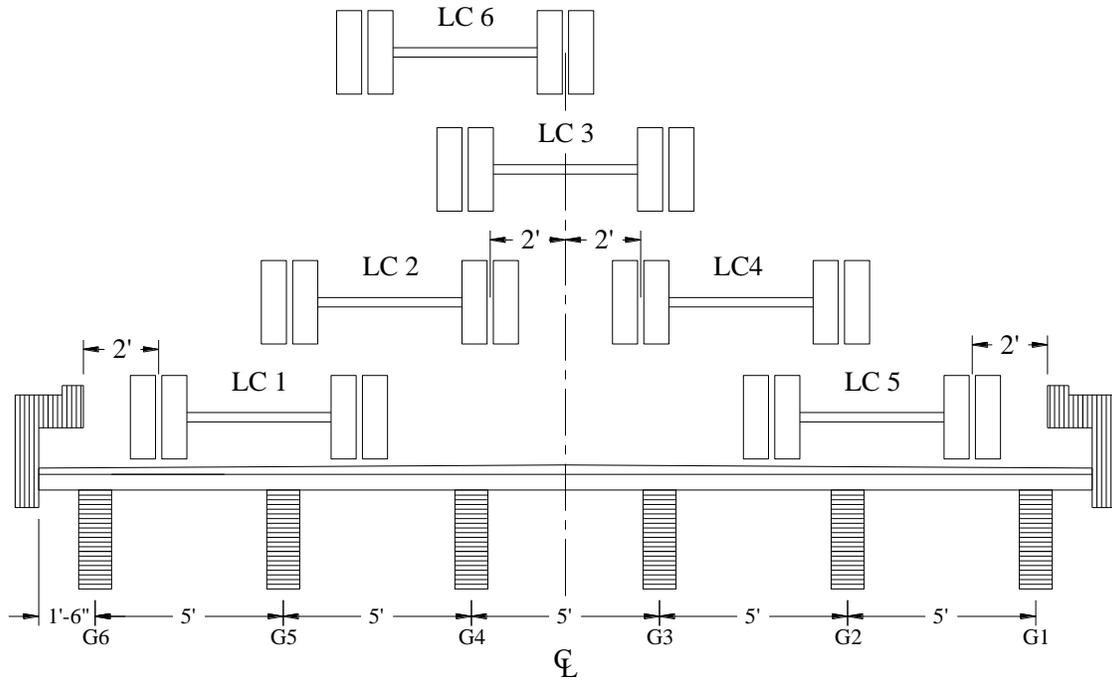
Load cases for demonstration bridge 2010 testing (looking north)
